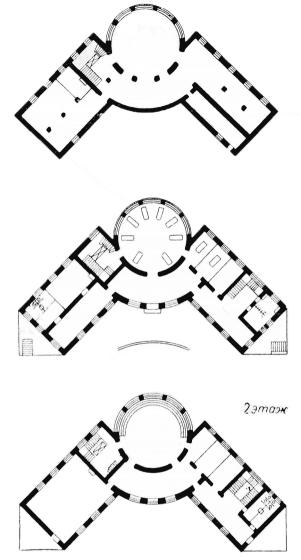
Floor plans to the technical project of the prosector's office building [13]
